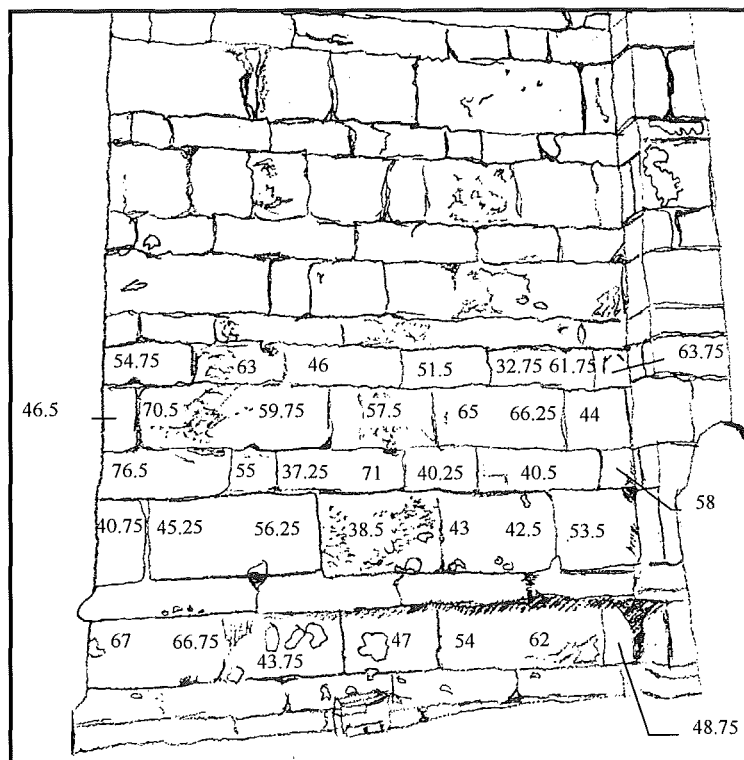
Sketch plan of Mary Tavy Church, south facing wall.
